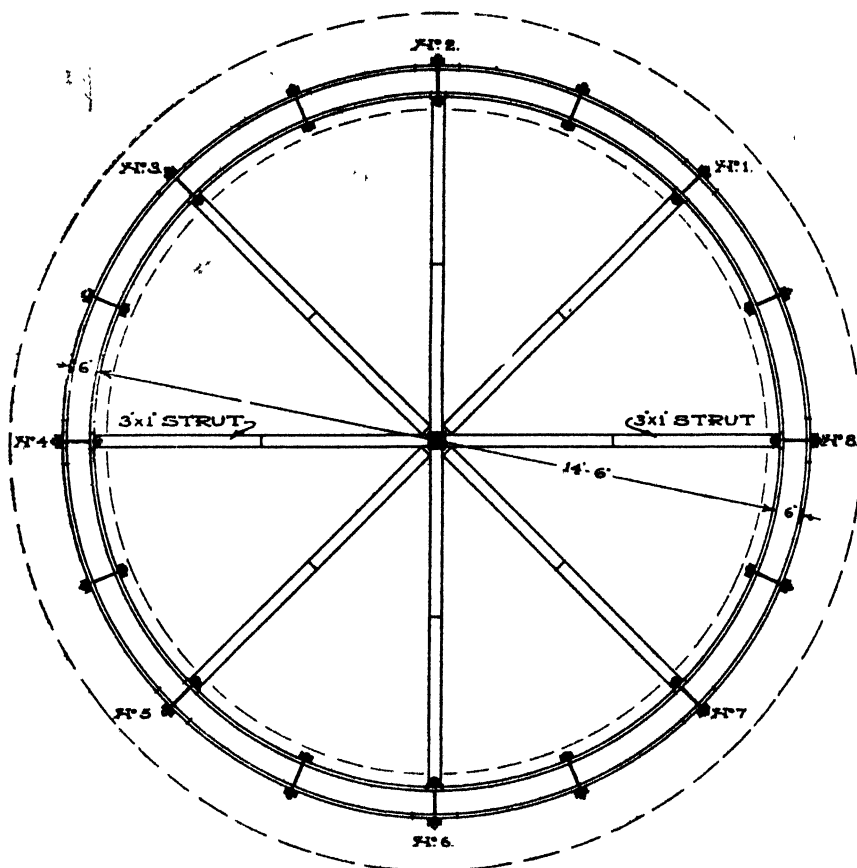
Plan showing Lay-out of Complete Set of Corrugated Iron Forms.
